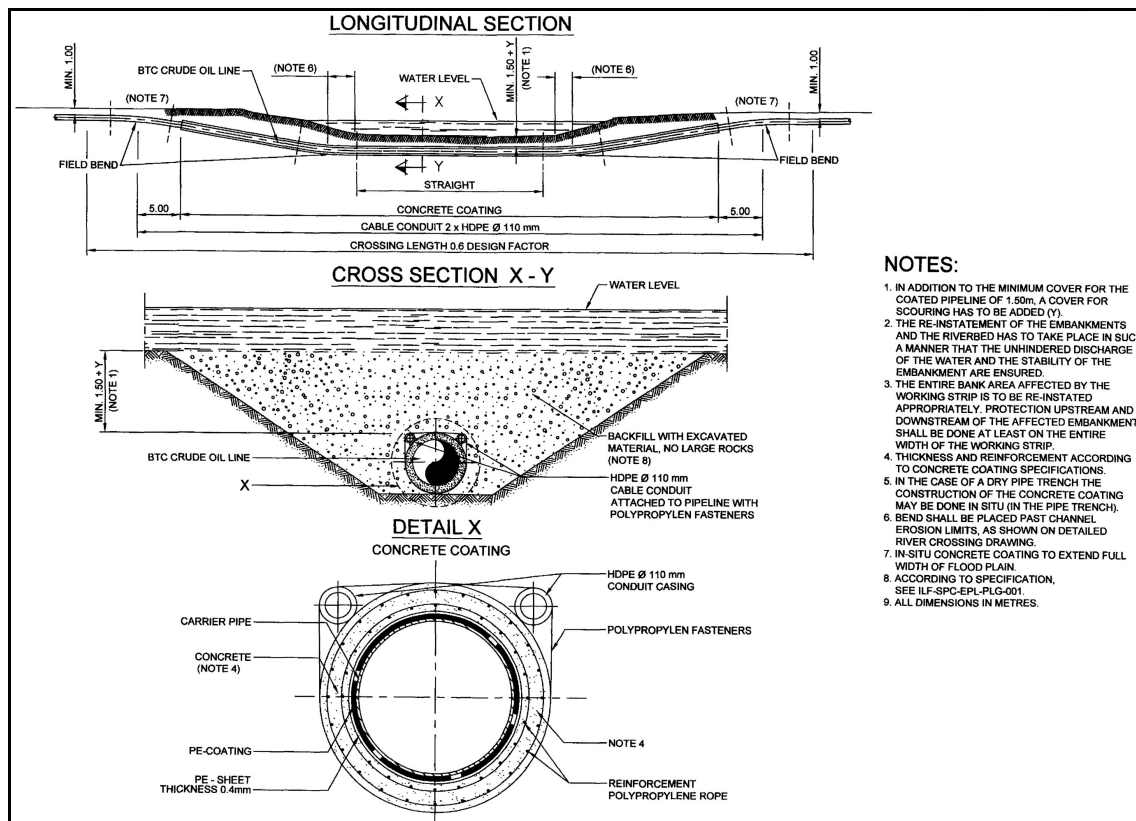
Typical Installation Details for a River Crossing [Ref 6]
